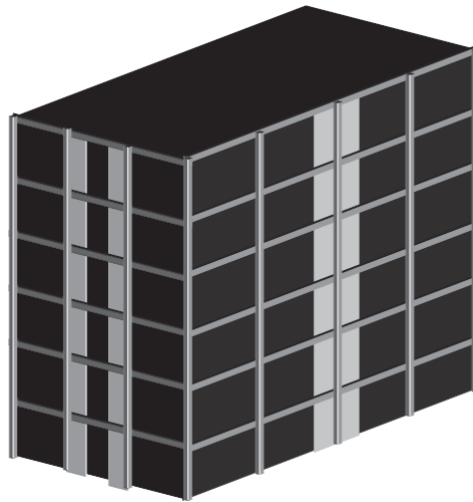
Axonometric view of the layout of side walls added to columns in model “Gregor”
